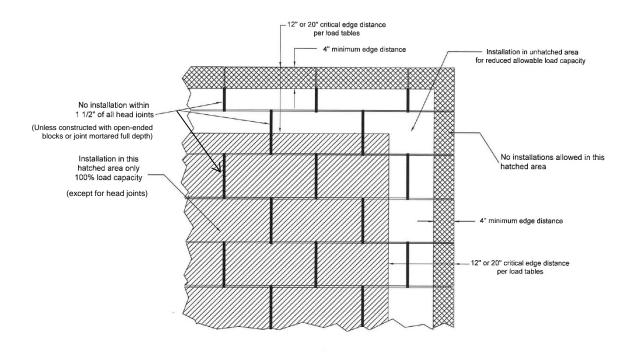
ILLUSTRATION OF PERMISSABLE LOCATIONS FOR RED HEAD C6+ ADHESIVE ANCHORS INSTALLED INTO THE FACE OF GROUTED CONCRETE MASONRY WALL (ELEVATION VIEW)
